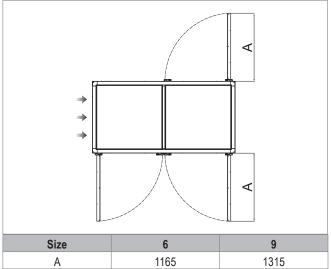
Space requirements for opening the access doors (dimensions in mm)
